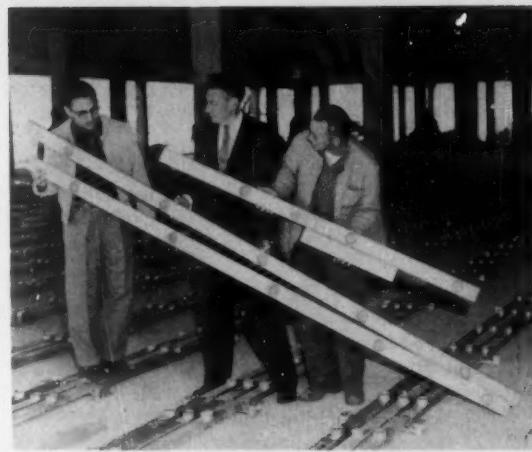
Column outlets supplement underfloor system. Duct-fed layout provides one telephone and one 110-volt outlet near column corners.
